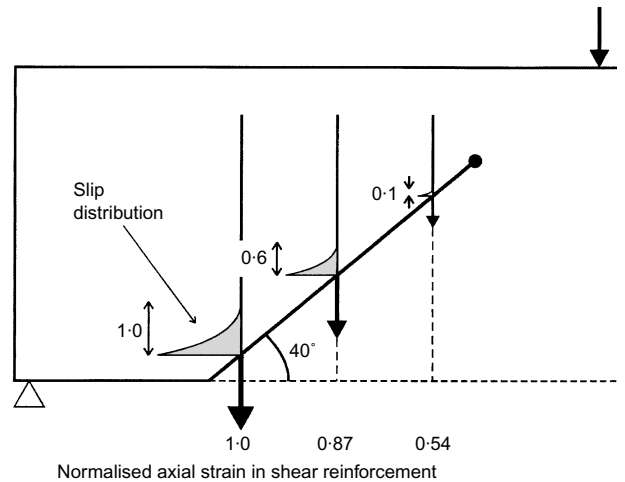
The variation in shear reinforcement strain and concrete–reinforcement slip along a shear crack, just before failure of the first stirrup.
